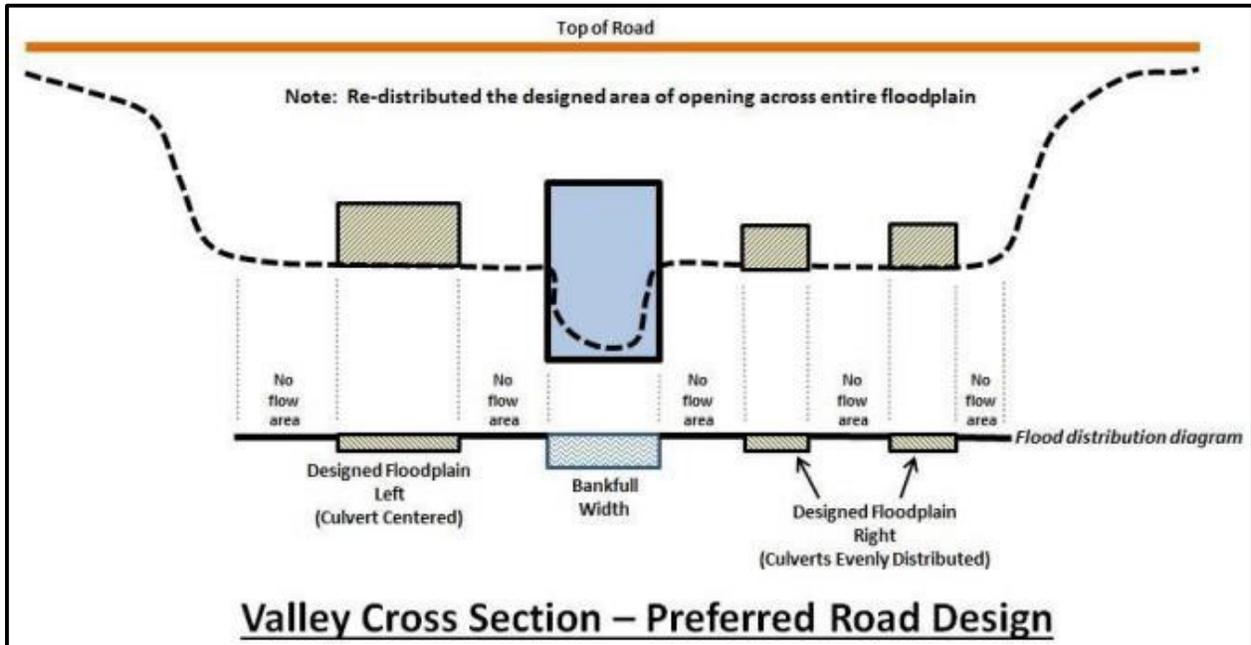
Road bisecting the floodplain with floodplain culverts.
